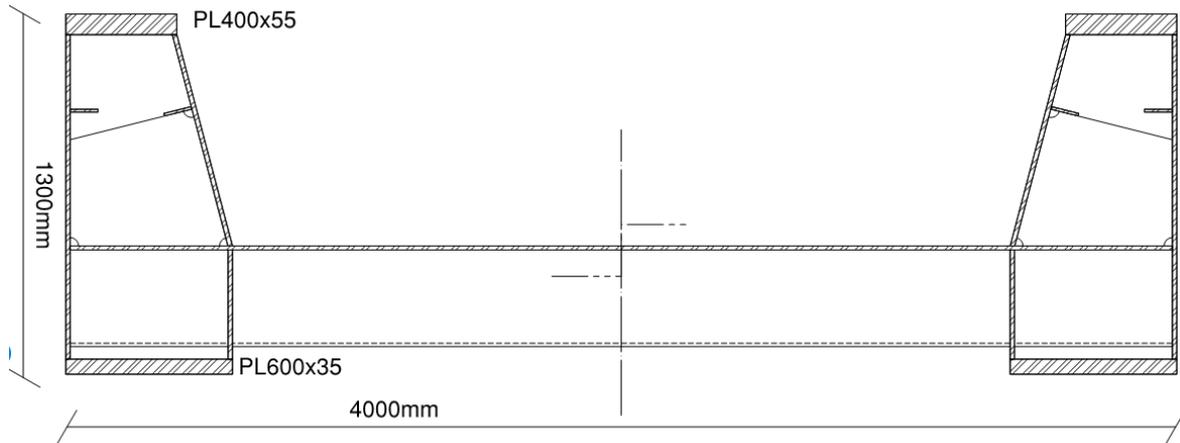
Cross section, loads are transferred from crossbeam to main girders
